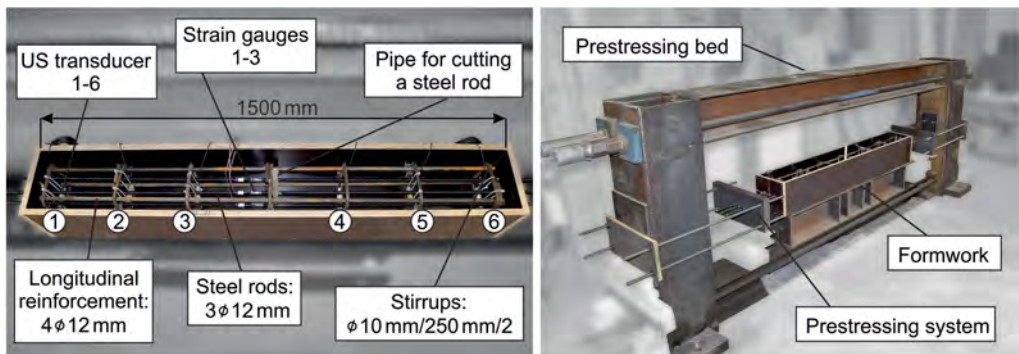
Test specimen of a pre-tensioned beam before concreting: formwork (left) and prestressing bed (right).
